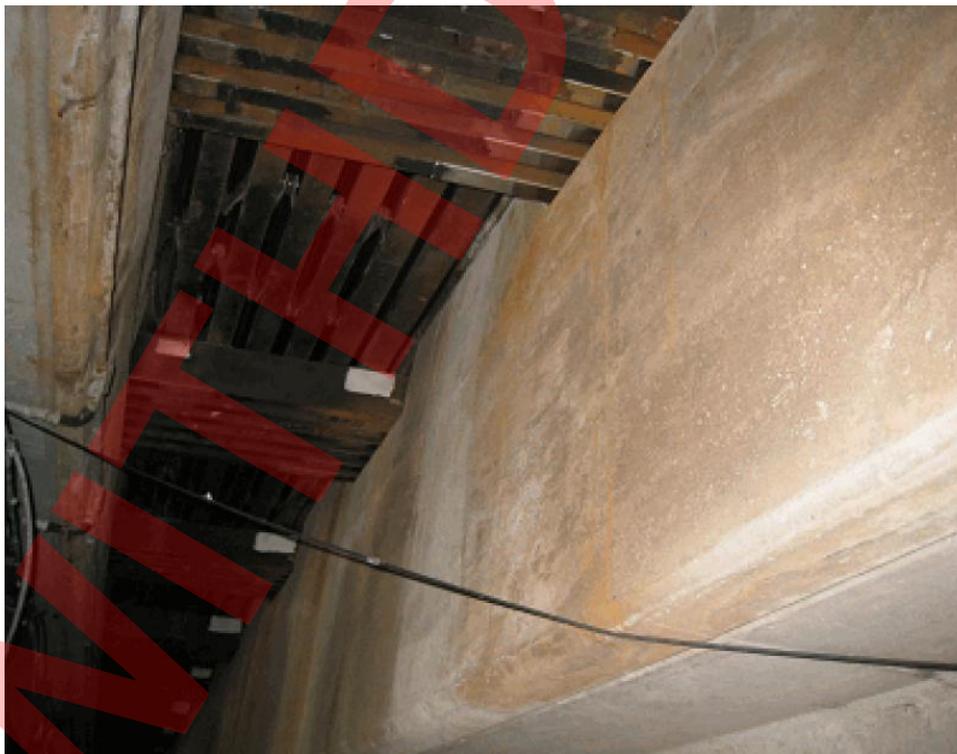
Cable Stayed Bridge (Composite steel-concrete deck) Built 1991
